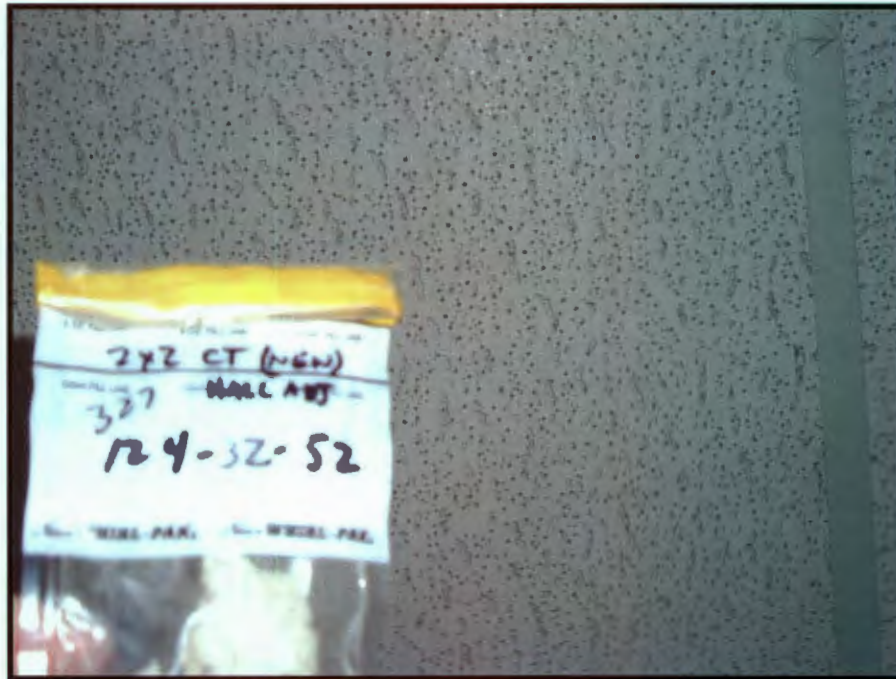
Sample 124-331-50, 2' x 2', White, Small Pinholes and Deep Fissures / Ceiling Tile
